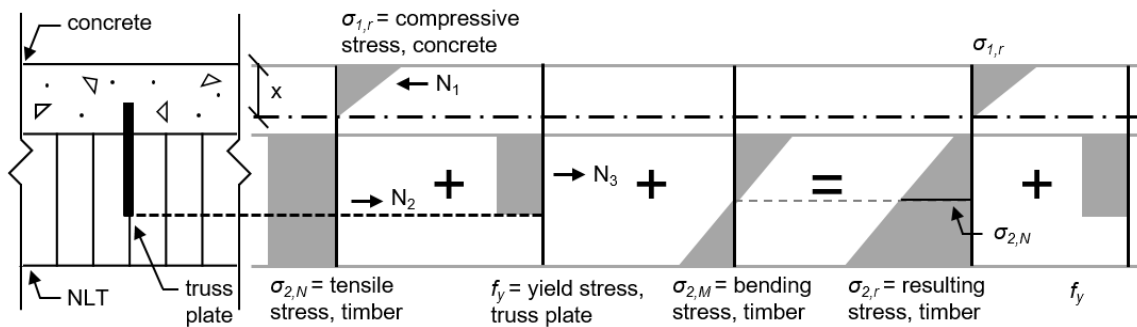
Stress distribution through an NLT-concrete composite floor with truss plate shear connectors
